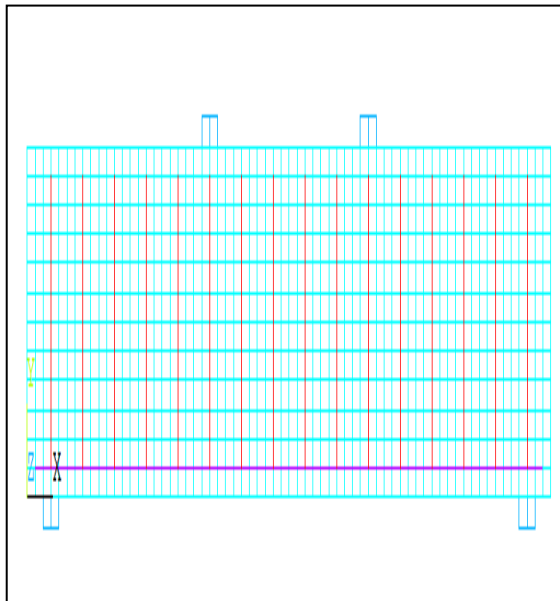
Side view show the reinforcements of simulated reinforced concrete beam.
